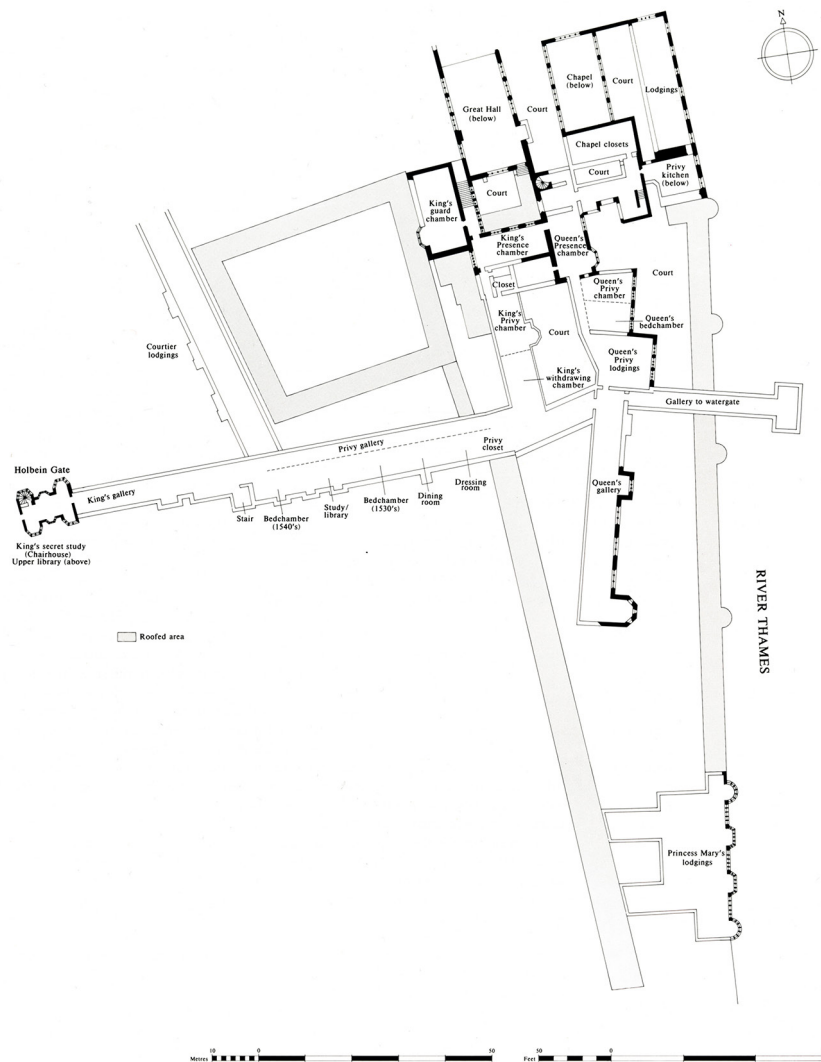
Reconstruction of the first-floor plan of Whitehall Palace in 1547.
